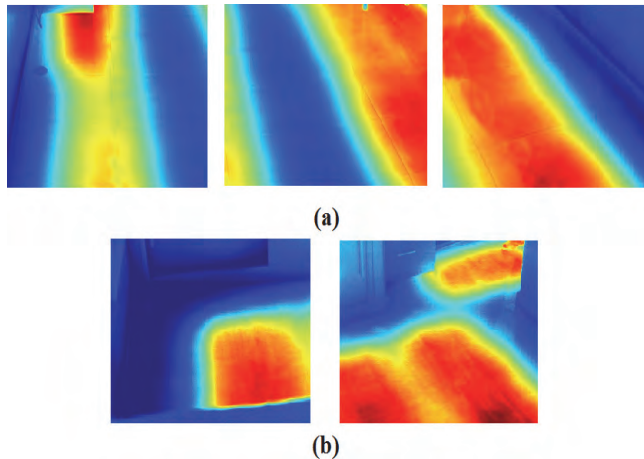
(a) Thermographic images acquired for the inspection of the 3 pipelines under the tiling floor. (b) Images of the thermographic measurement of the radiant heating floor installation in the bedroom (parquet flooring).
